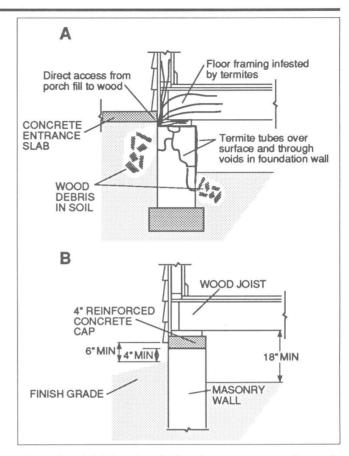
(A) Ways in which subterranean termites gain access to a building substructure from debris in the soil. (B) Use of a concrete cap to prevent termites from traveling to wood through a masonry foundation. Also, suggested minimal spacing between soil and substructure. A crawl space clearance greater than 18 inches often makes it easier to inspect the area for termites and decay.
